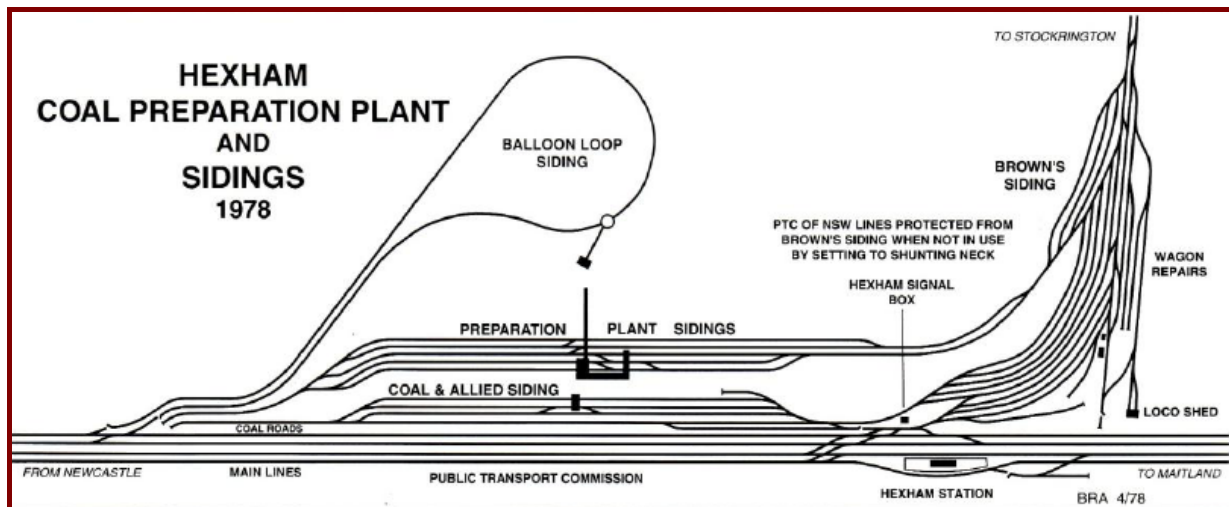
Plan of the site: Brian Andrews, Coal, Railways & Mines.
